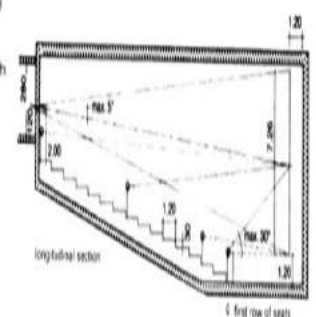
EXAMPLES OF VIEWING SPACES FOR WHEELCHAIR USERS
